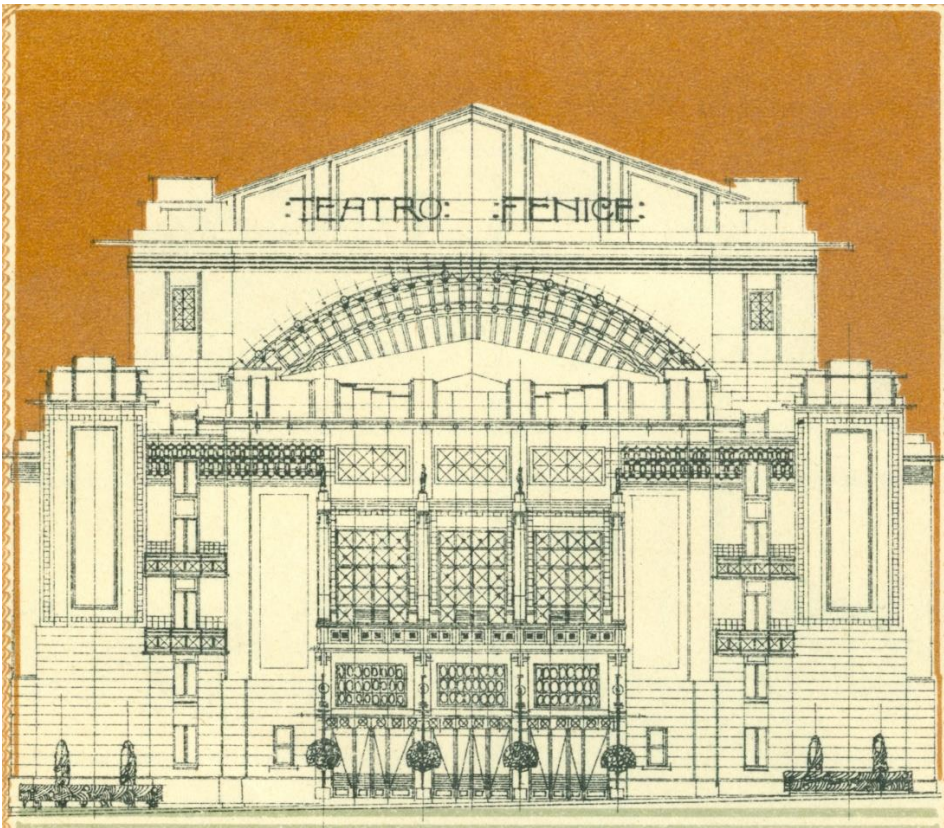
The Fenice Theatre, the main façade, detail from a Share of a joint stock Teatro Fenice* (source: private collection)
